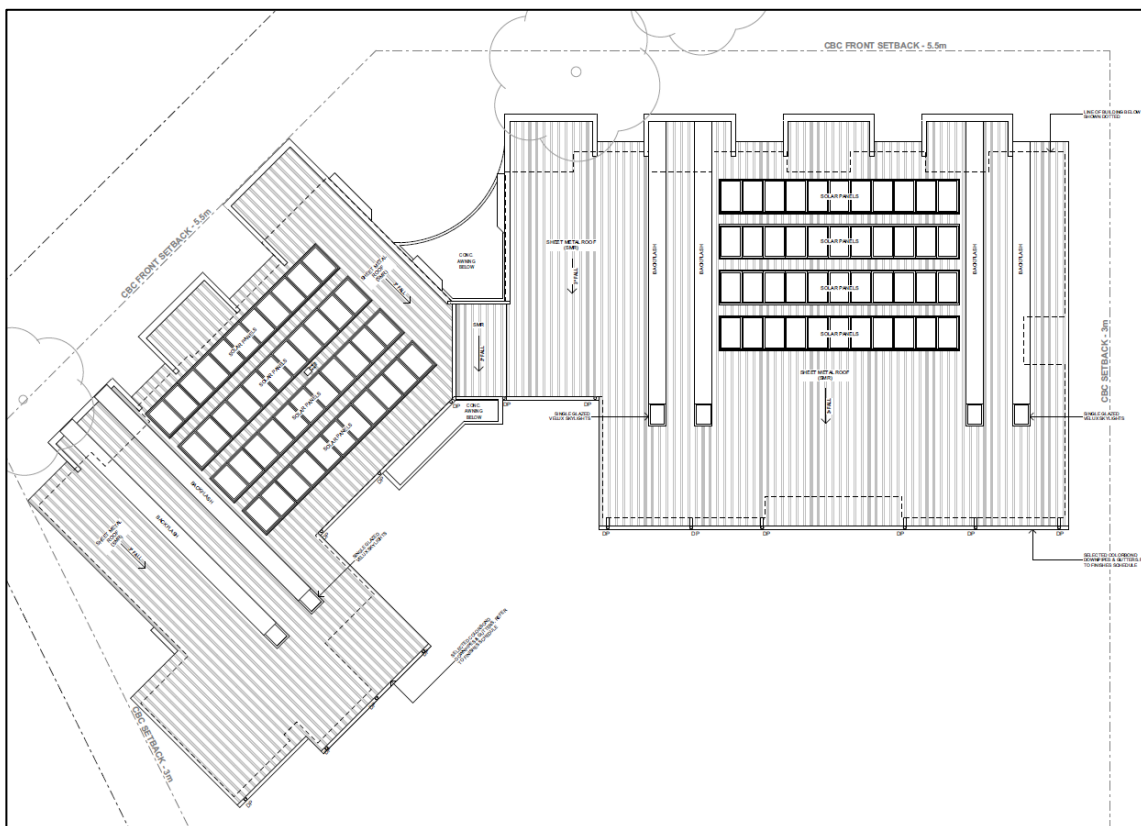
Extract from Architectural Plans – Roof Plan (Source: DEM (Aust), dated 10/02/2025)
